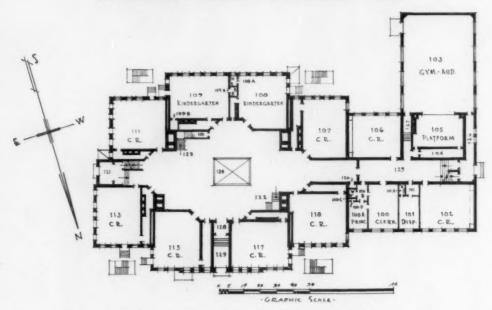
Rutherford B. Hayes Elementary School, first floor plan after rehabilitation and addition
